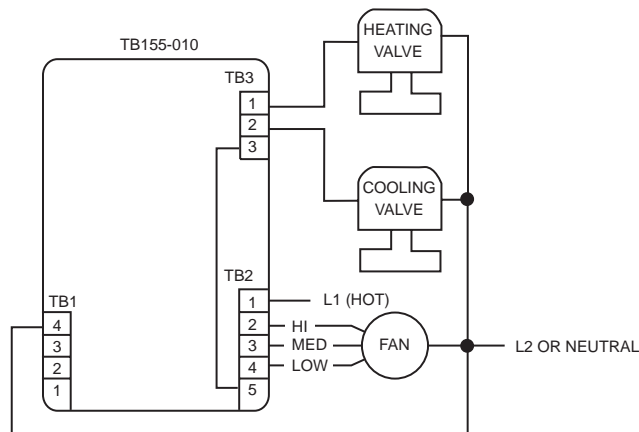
Typical 4-Pipe Heating/Cooling Fan Runs Continuously with System Switch On. With System Switch Off, Fan is Off.
